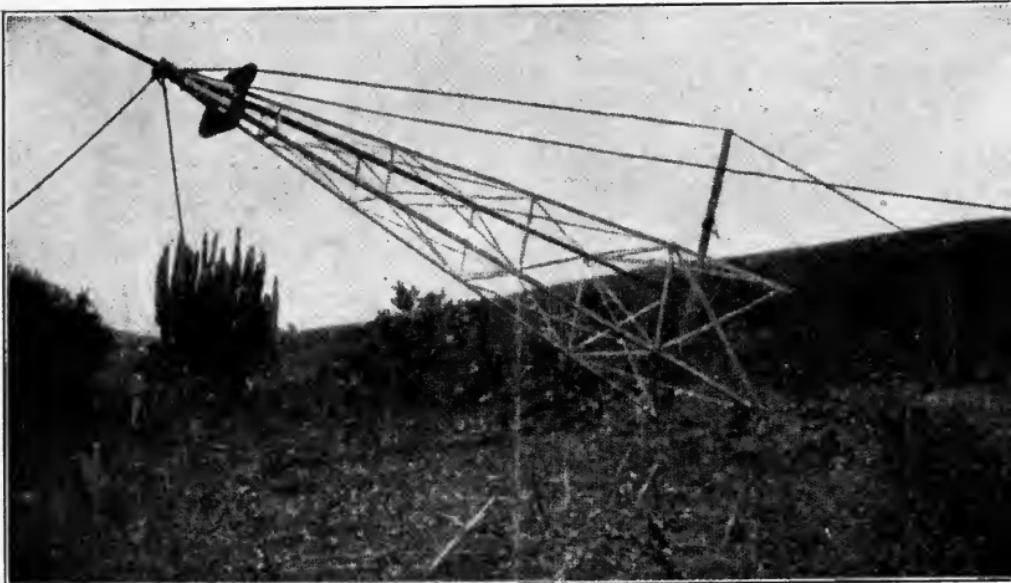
Method of Erecting Steel Tower Shown in Fig. 90
